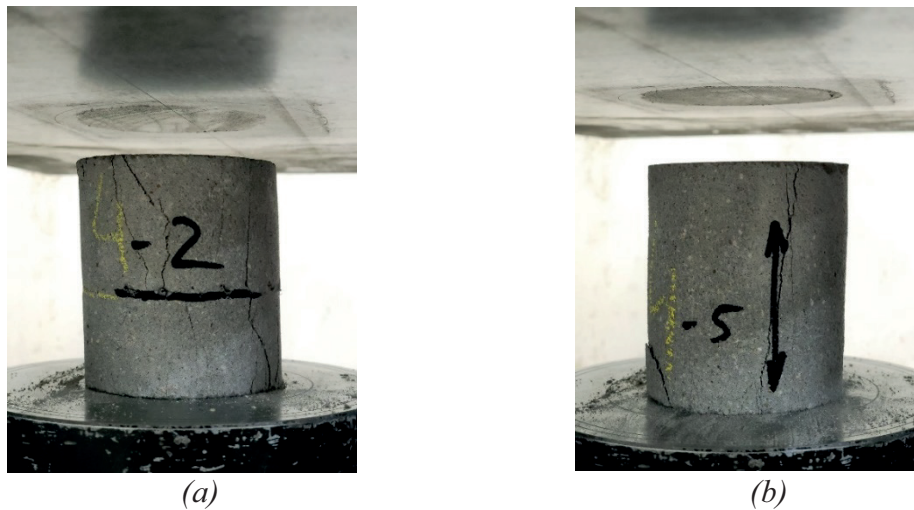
Test of cylinder specimens for determining the compressive strength of concrete ( $R_b$ ) a - test with loading perpendicular to the extrusion layers; b - test with loading parallel to the extrusion layers
